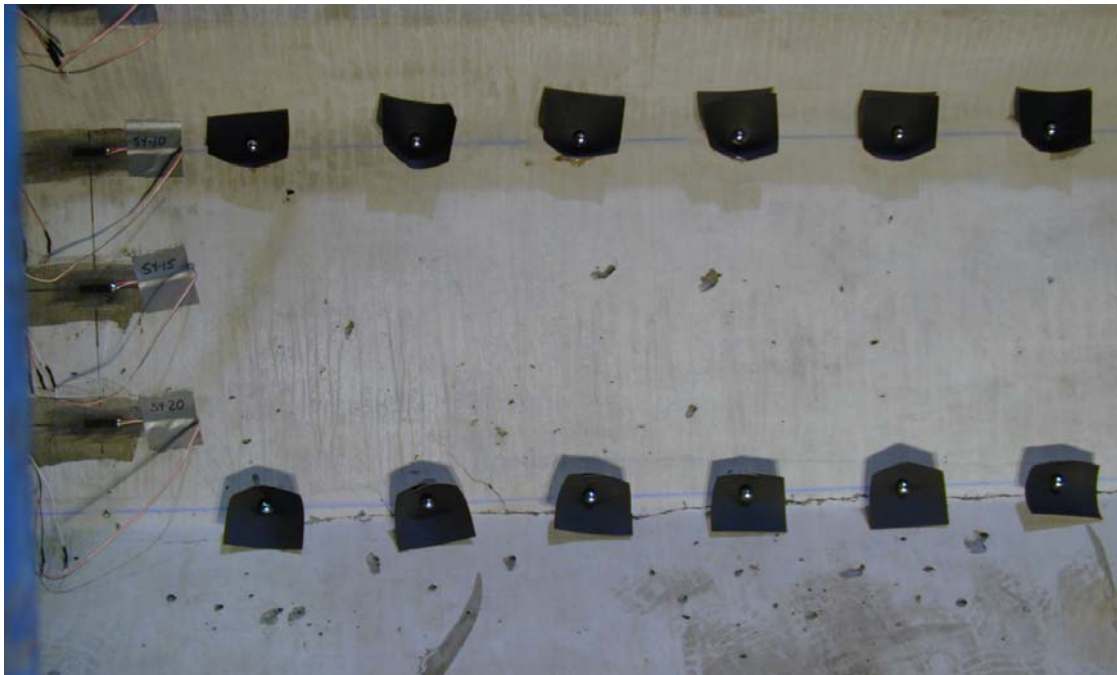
I: Crack at south base of Girder 28S web at a load of 450 kips
